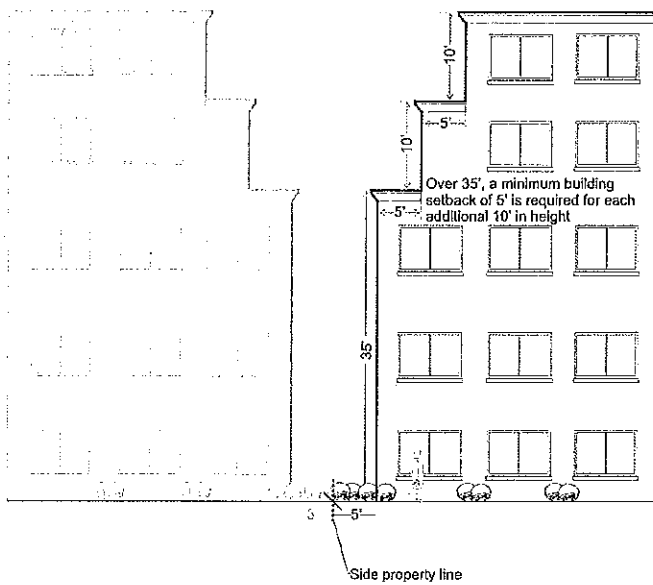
Additional side yard standards where buildings exceed 35 feet in height.
